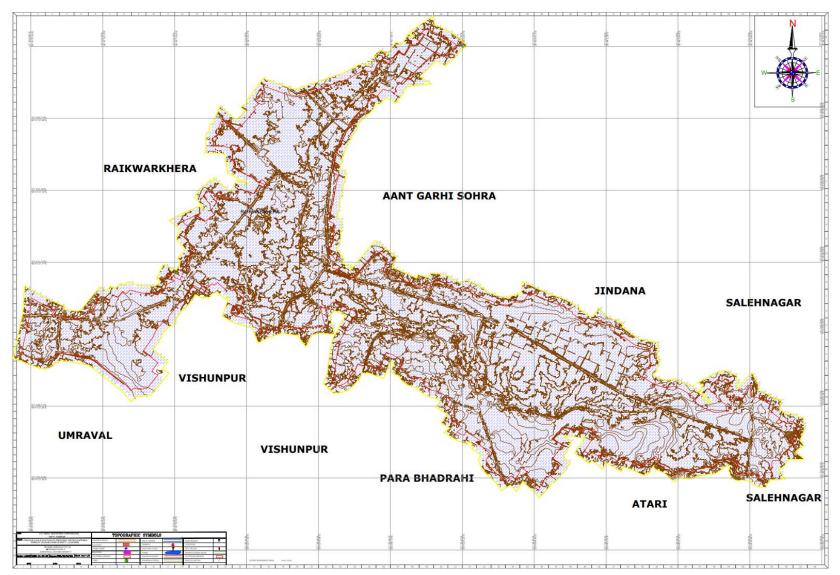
CONTOUR PLAN OF PM-MITRA PARK SITE AT LUCKNOW
